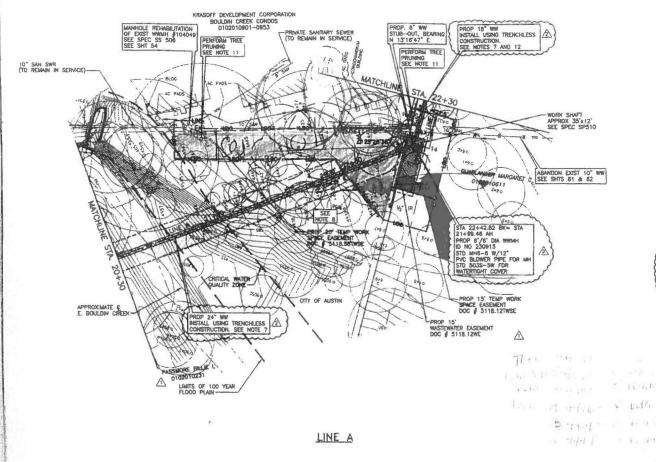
Exhibit II Plan Sheet with Easements and Limits of Construction Shown
